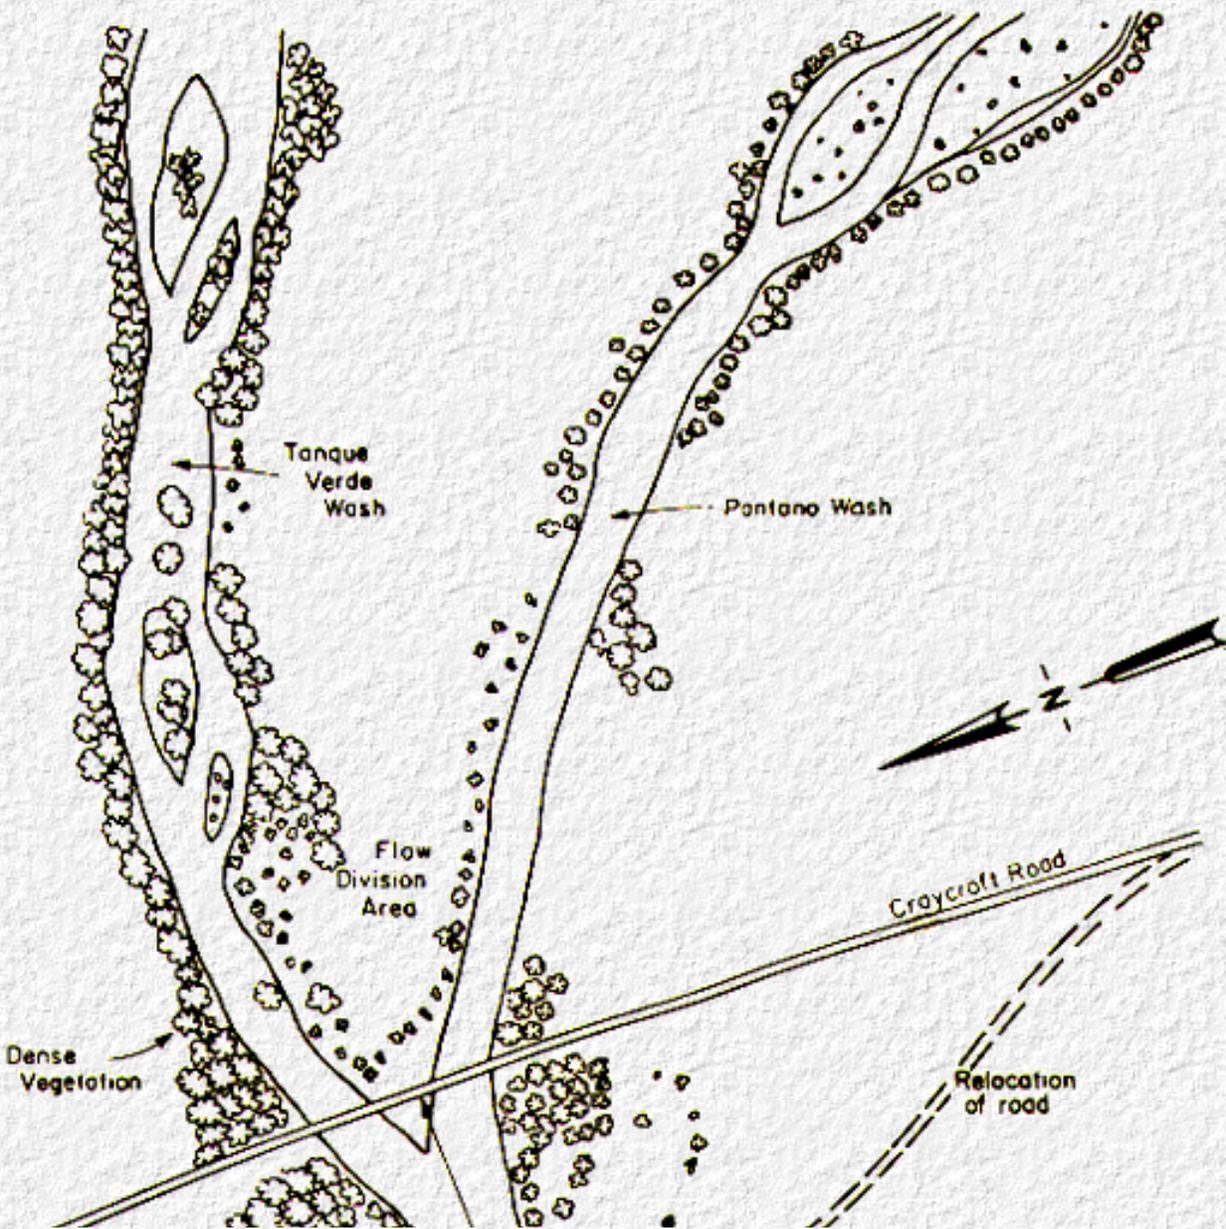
Alternative I for Craycroft Road Bridge Crossing
